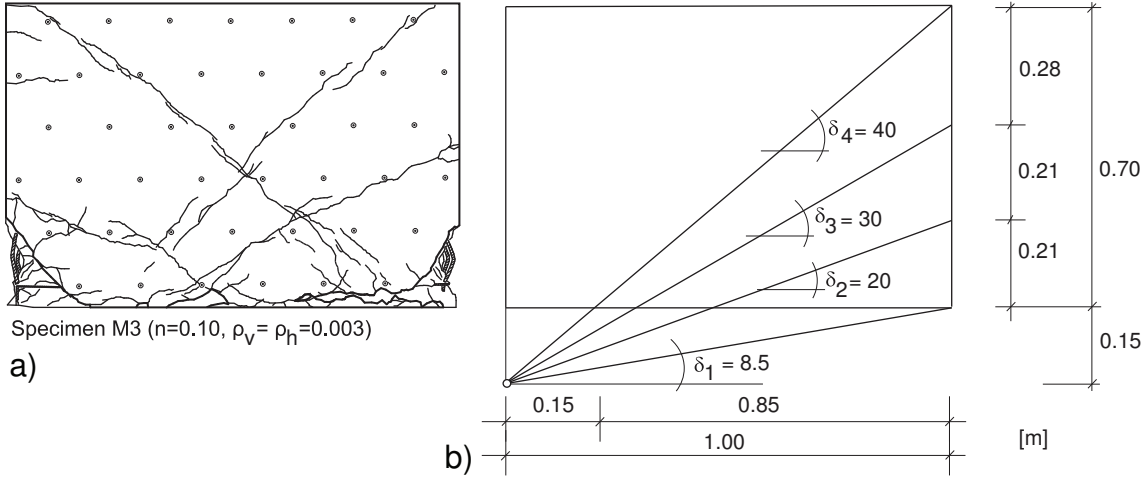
Development of crack pattern: a) test (Specimen M3), b) crack pattern for wall length of 1 m and wall height of 0.70 m.
